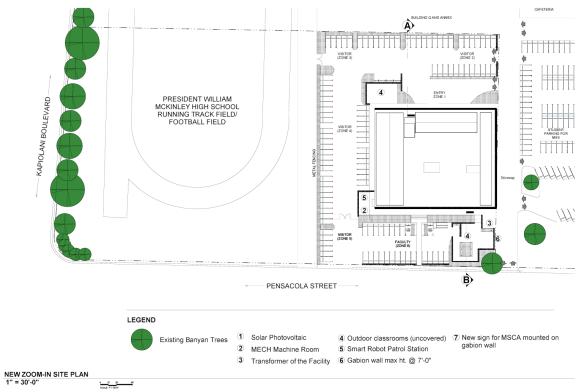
MSCA NEW MASTER SITE PLAN
